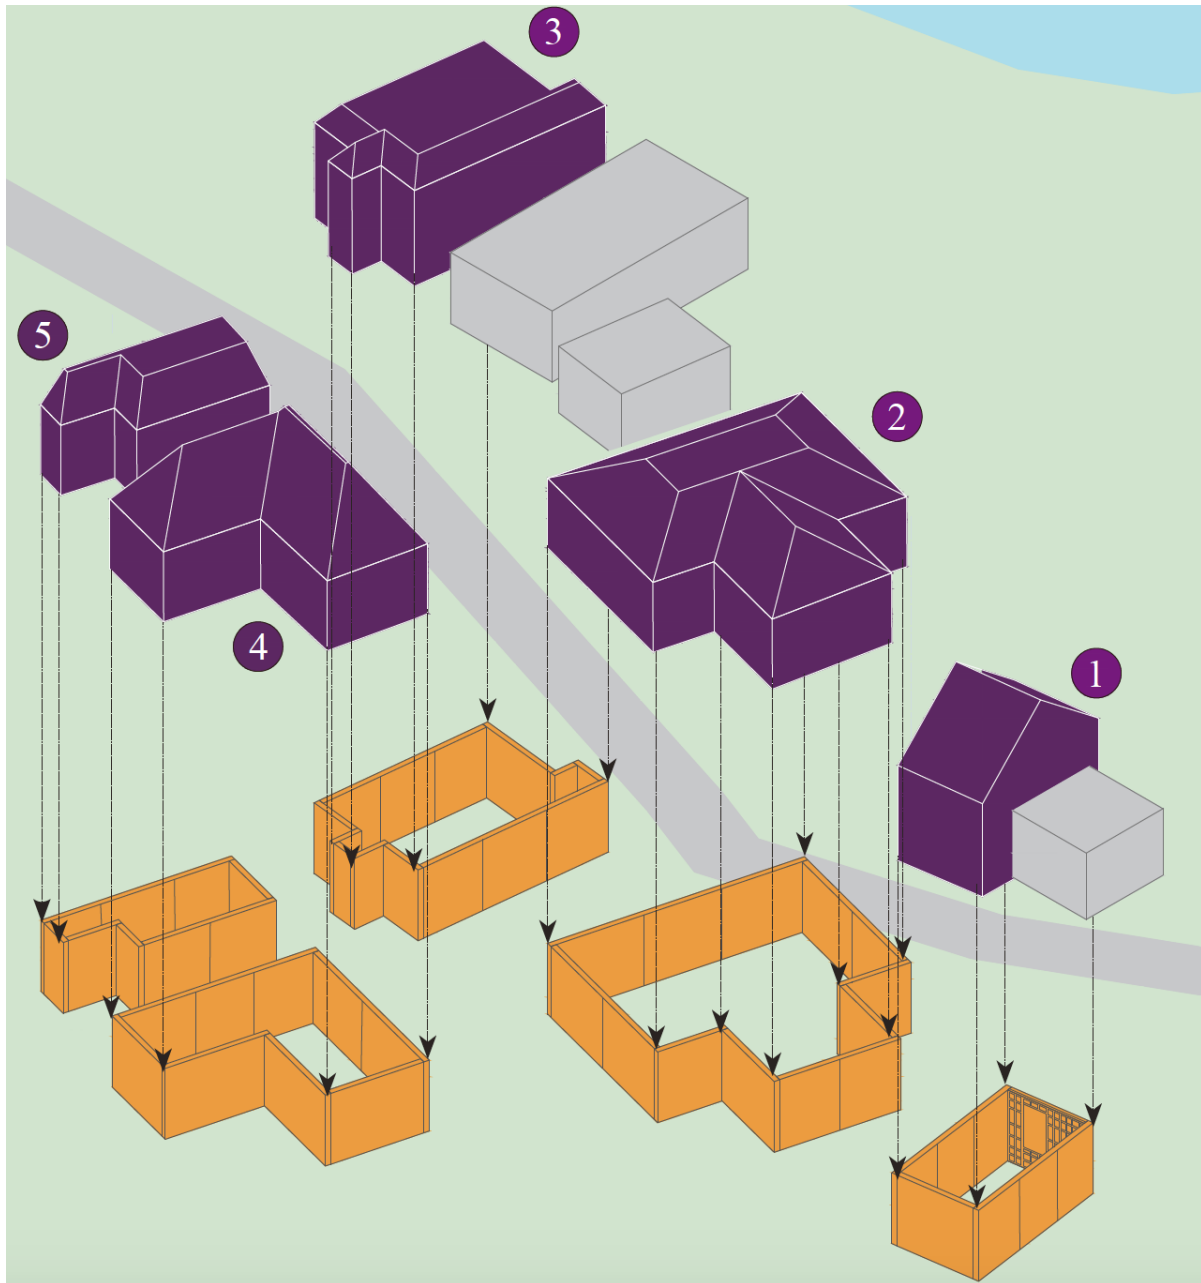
51 standard wall panels extracted from 5 island homes in Vinalhaven's downtown.
